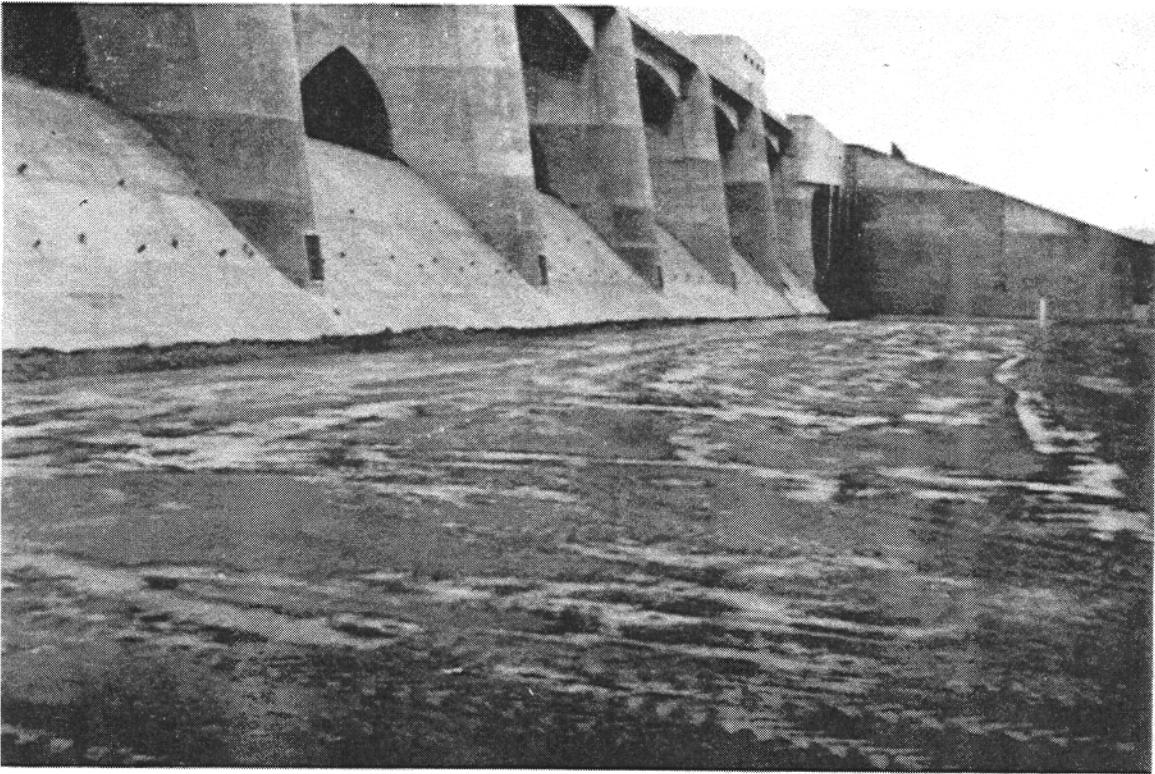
Approach to Spillway, with Spillway at left (view from approach slab to spillway, looking toward southwest).
